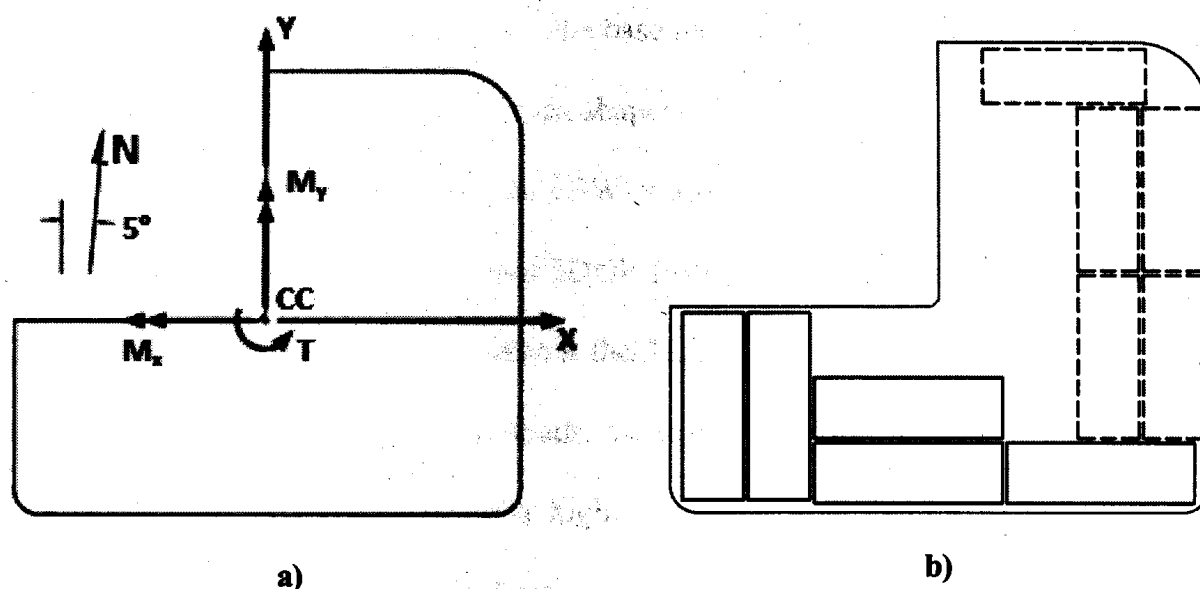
The building floor plan with a) the coordinate system and b) the TLD system arrangement for tanks tuned to mode 1 (solid line) and mode 2 (dashed line).
